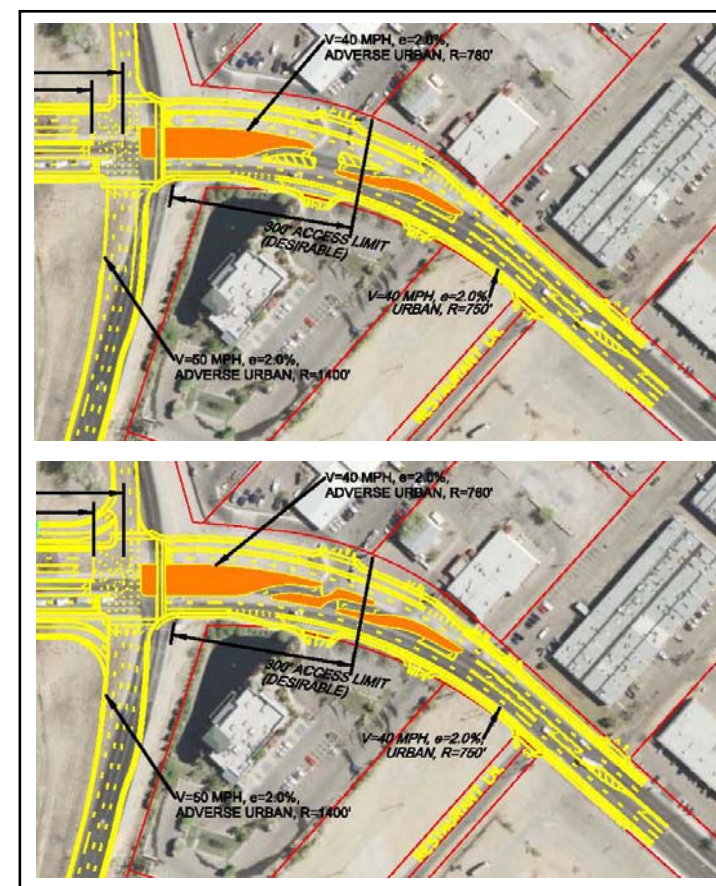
, Eliminated Access Schemes on Jefferson Street East of I-25
